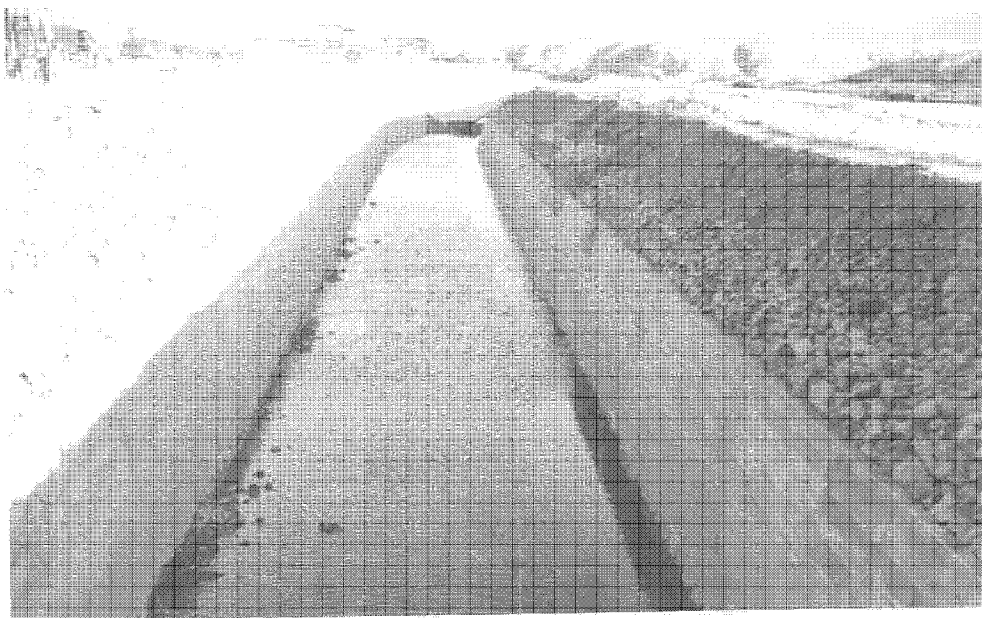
Open Section "B" Looking Downstream, 1 May 1938.
